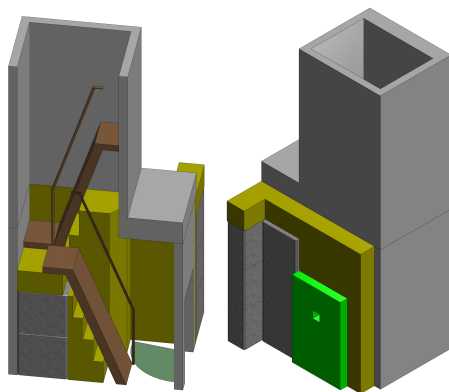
The emergency exit shaft with stairs and beam dump casing. Here, one can see that the special form for the casing is required to conserve the emergency exit shaft. To gain as much space as possible for the concrete shielding the first stairs are shifted towards the door. In front of the hole (visible in Fig. 4) a lead wall is installed to reduce radiation propagating towards the test area.
